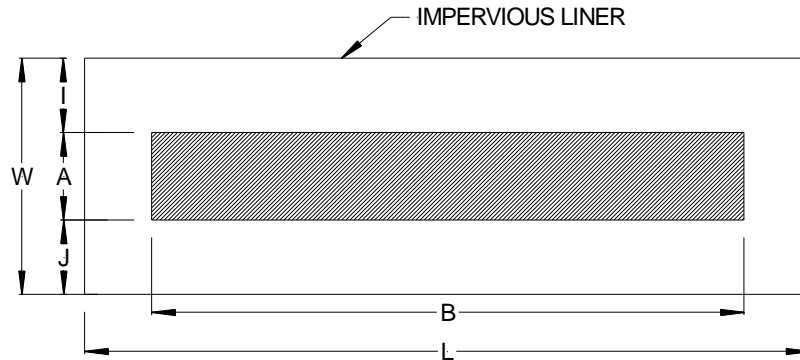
PLAN VIEW – MOUND IN BOX SYSTEM
